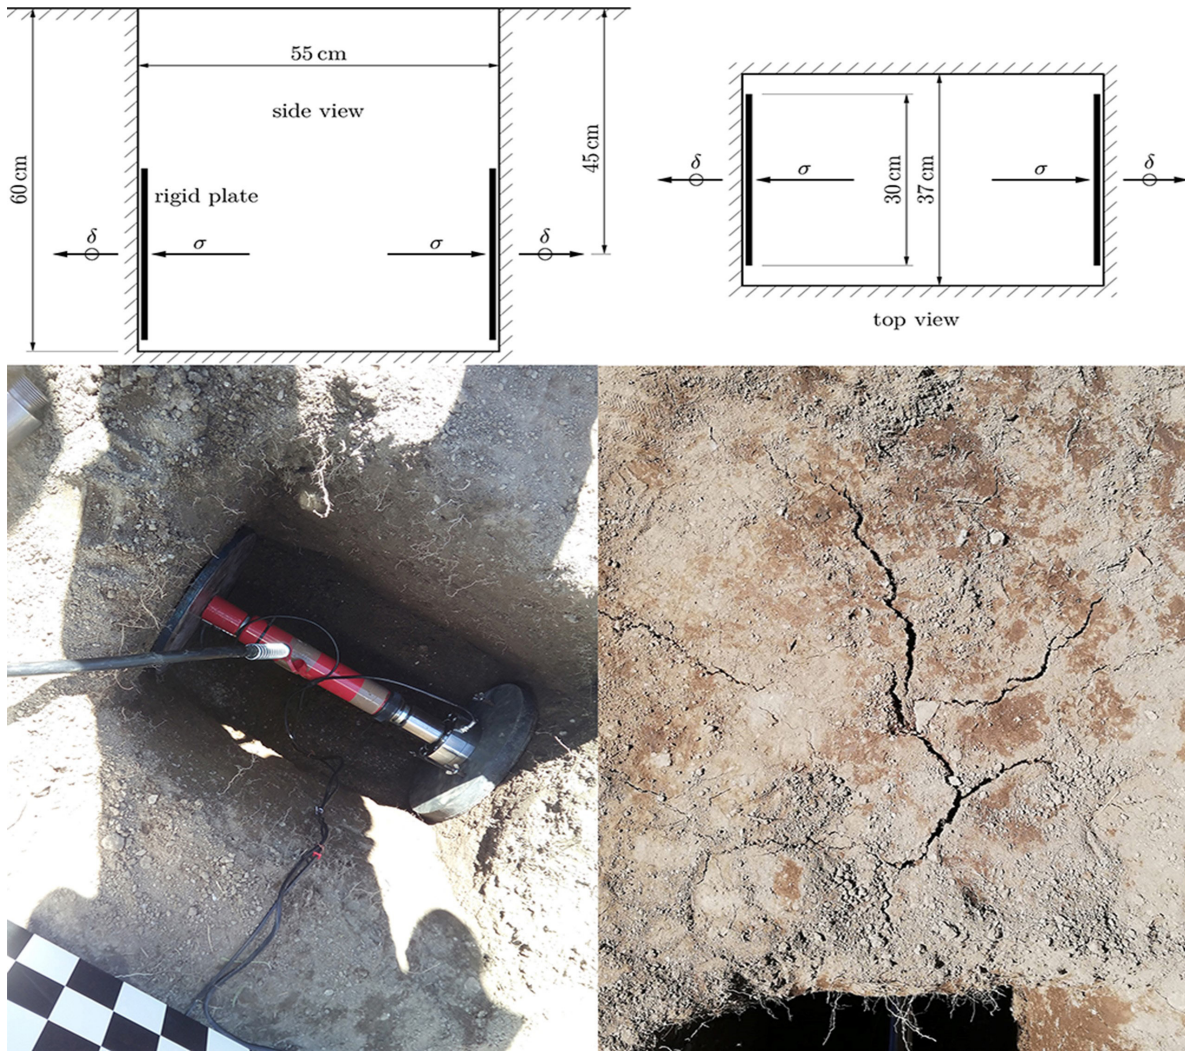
Horizontal load plate test geometry, assembly, and induced cracks.
